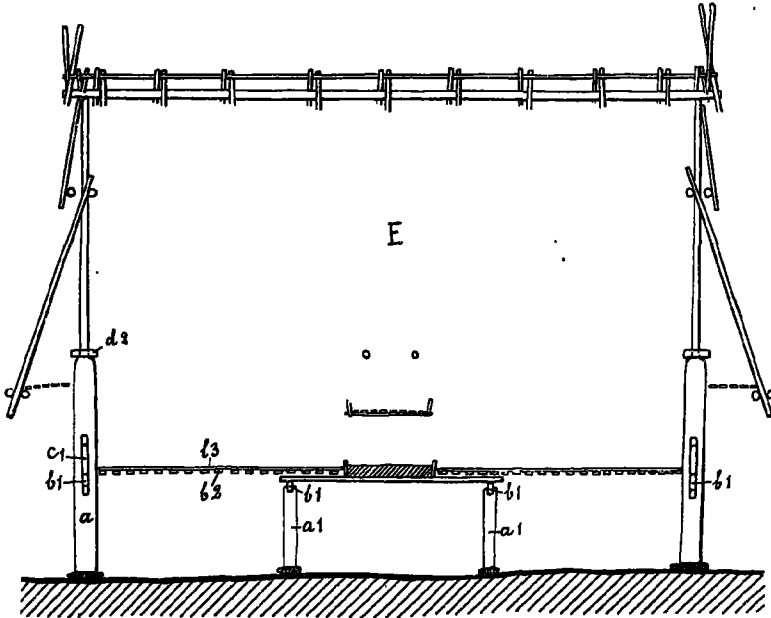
Koelawi house of type C. a: foundation; b—b²: floor; c, floor frame; d—d²: walls; w: scuttle.
